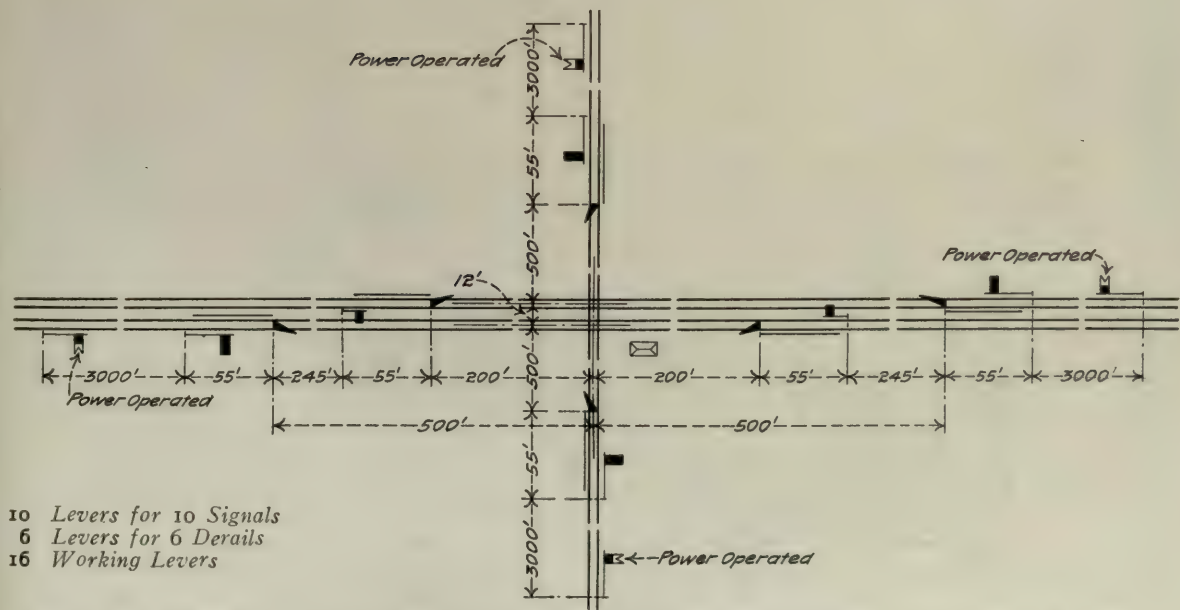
Standard Interlocking Plan for Single Track Crossing Double Track. New York Central & Hudson River.
